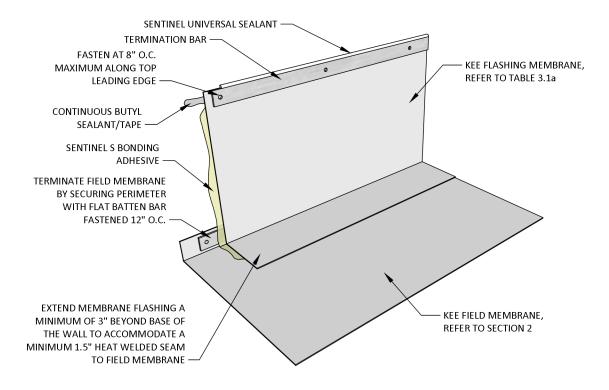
Adhered KEE Flashing Membrane at Wall/Curb with Vertical Perimeter Fastening
